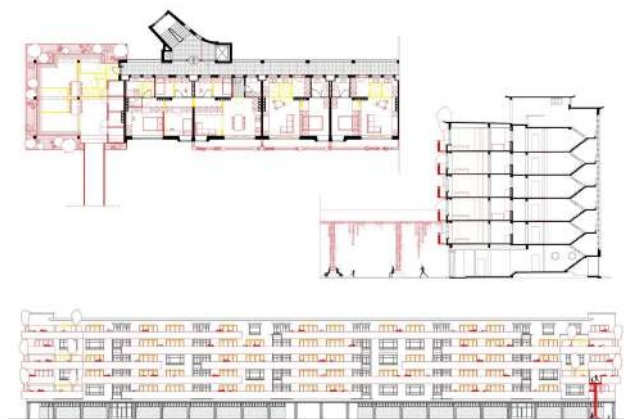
Parasite-strategy: addition of balconies creating collective open terraces on every other floor in the mid-rise buildings of the Jan De Voslei in Antwerp; floorplan, section and elevation. Source: Caroline De Queker and Toke Vanhove
